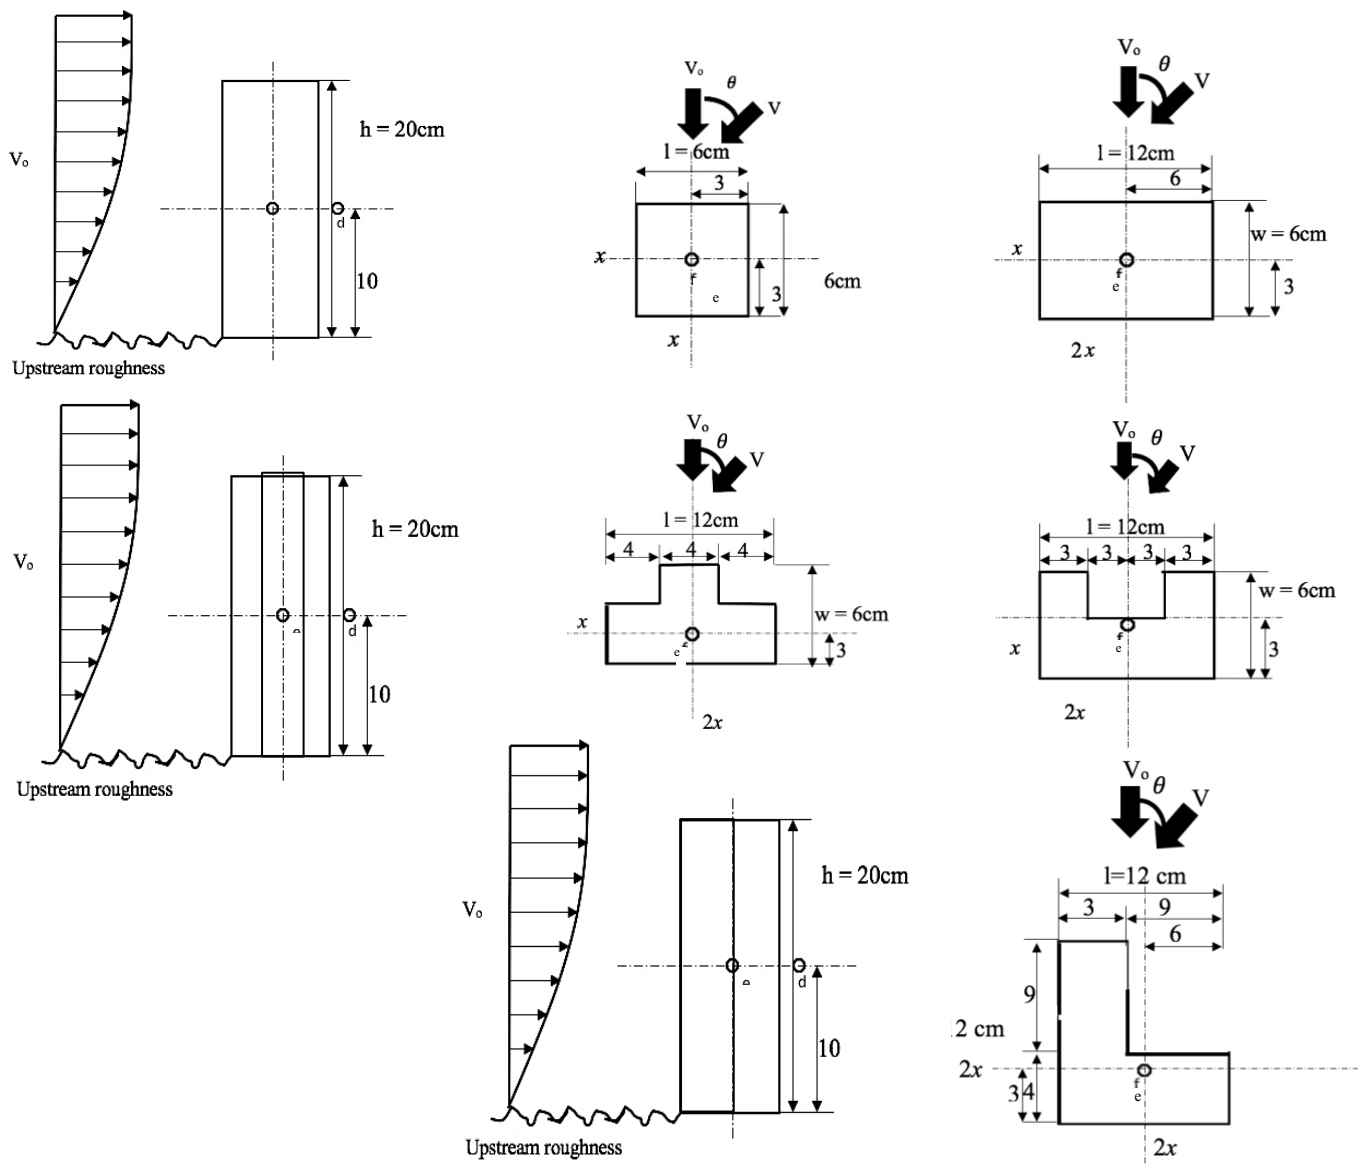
Model dimensions and measuring points for the square, rectangular, U-shaped, T-shaped, and L-shaped buildings
